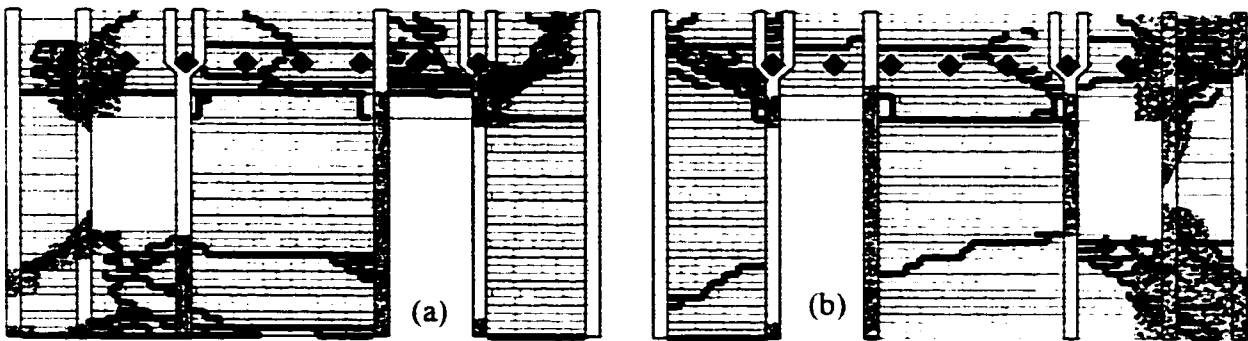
Crack pattern on shear wall repaired with Tyfo after cyclic test: (a) West wall; (b) East wall. (Shaded area indicates Tyfo material debonded).
